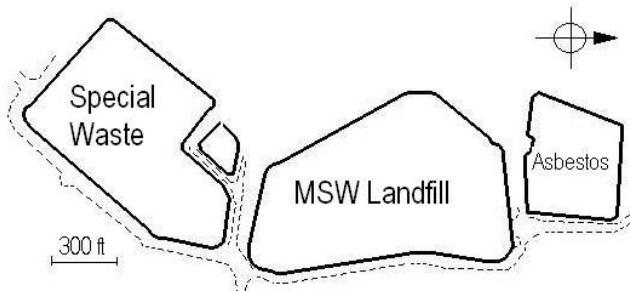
Site plan of landfill at Norridgewock, Maine before the 16 August 1989 MSW Landslide. The small polygon next to the Ash/Sludge (Special Waste) Landfill was a leachate storage pond.
